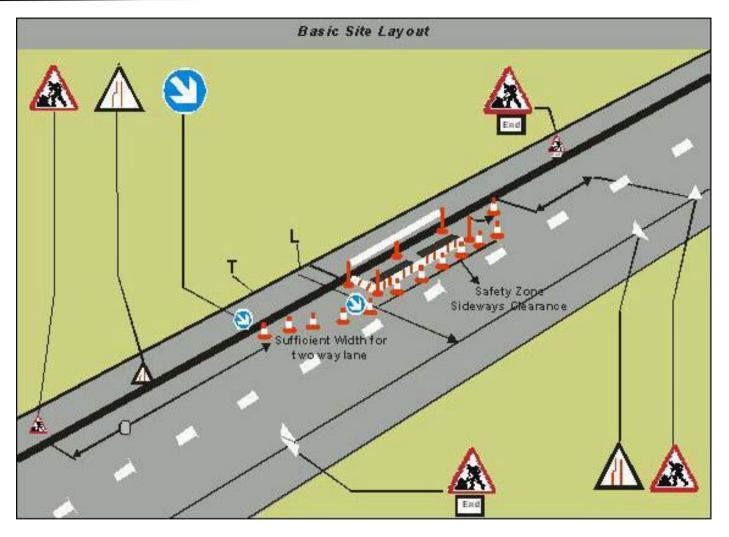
Basic Layout for Signs at a Road Works Site, Including Work Space and a Safety Zone.
